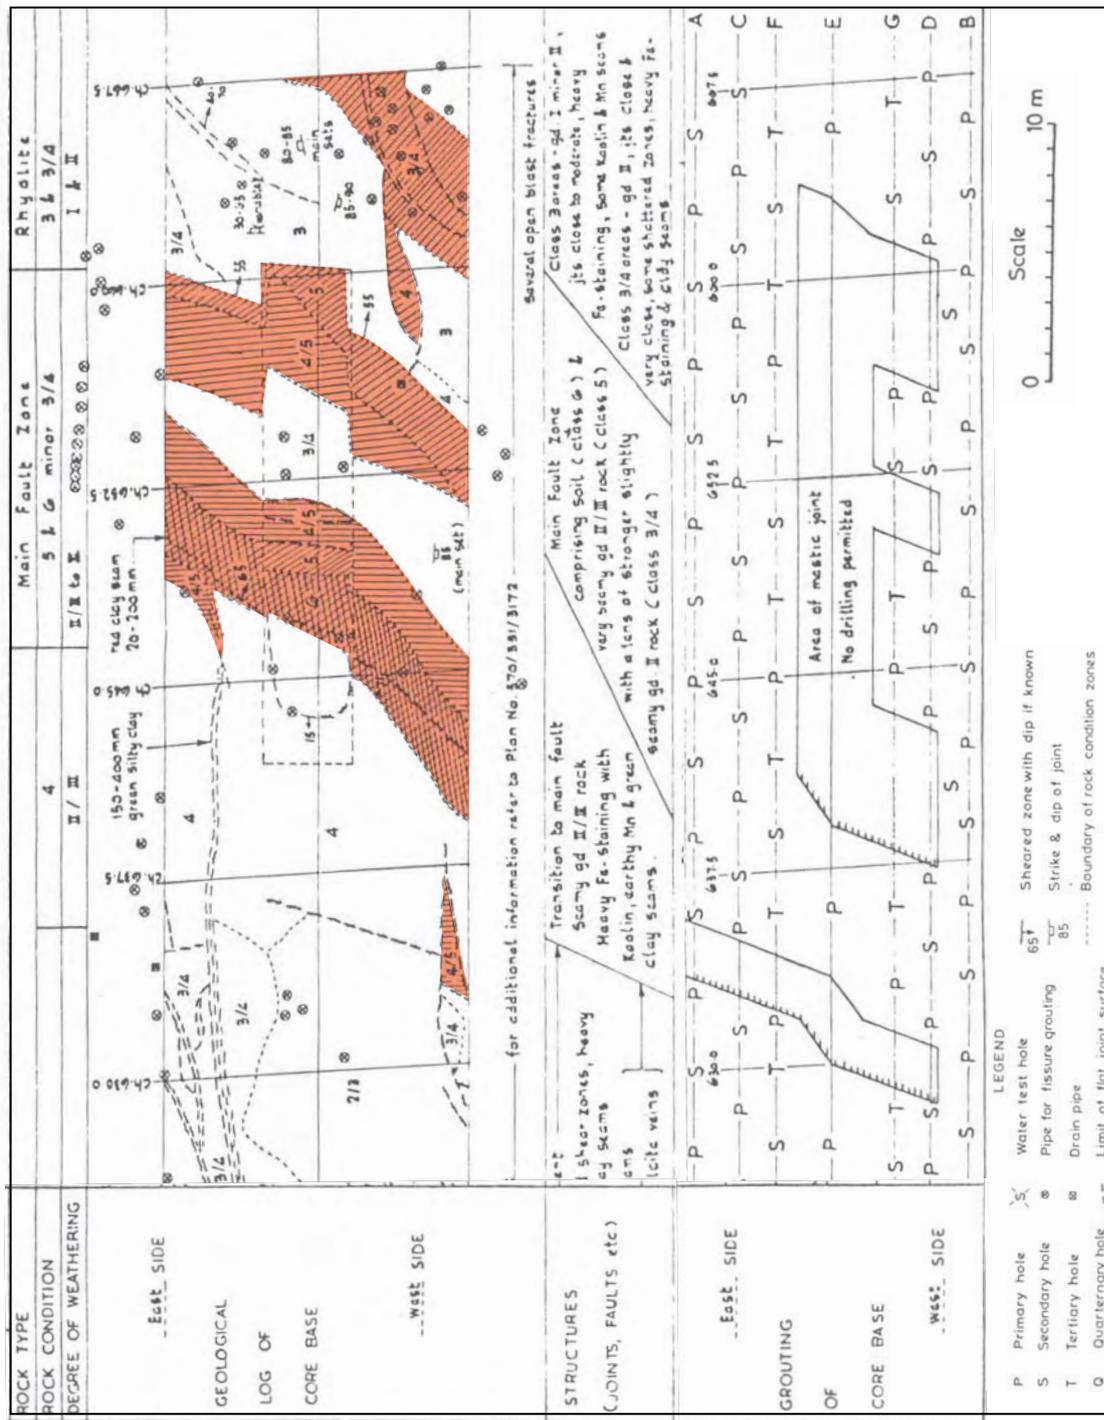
Detail of the engineering geological plan and grouting layout for the groundwater cut-off beneath the core of the West Dam of the High Island Reservoir (after Watkins, 1979)
